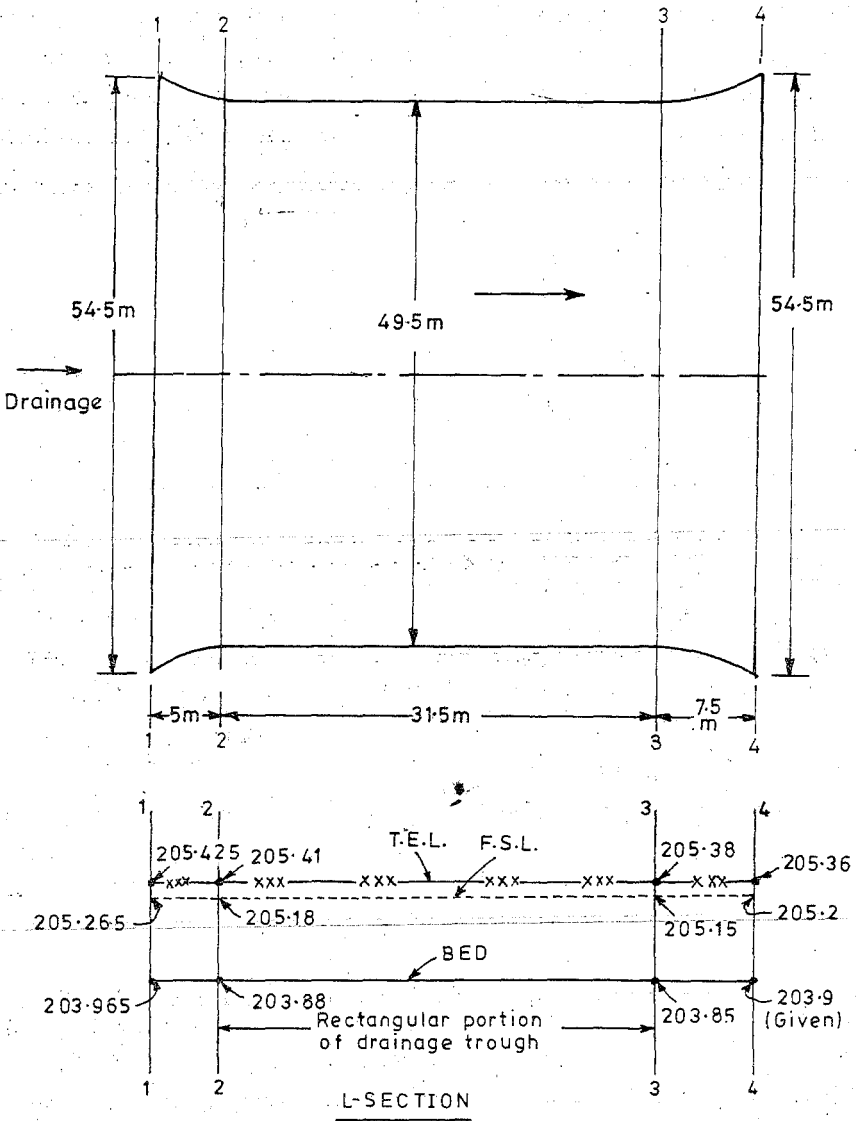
Plan and L-section of Drainage trough carried over the canal.
